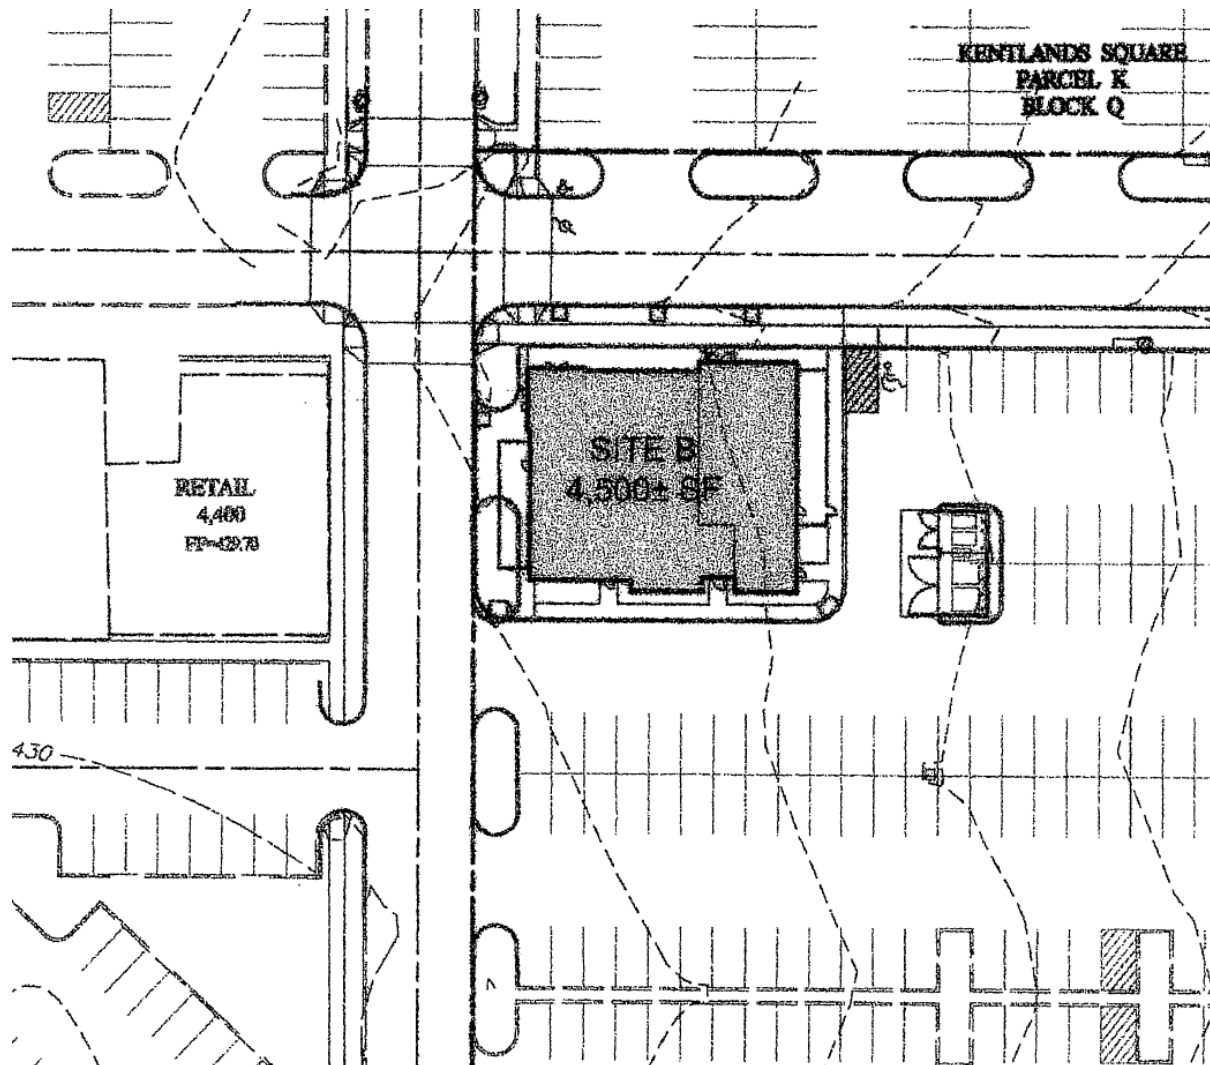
, AFP-02-026 – Site Plan (excerpt)
